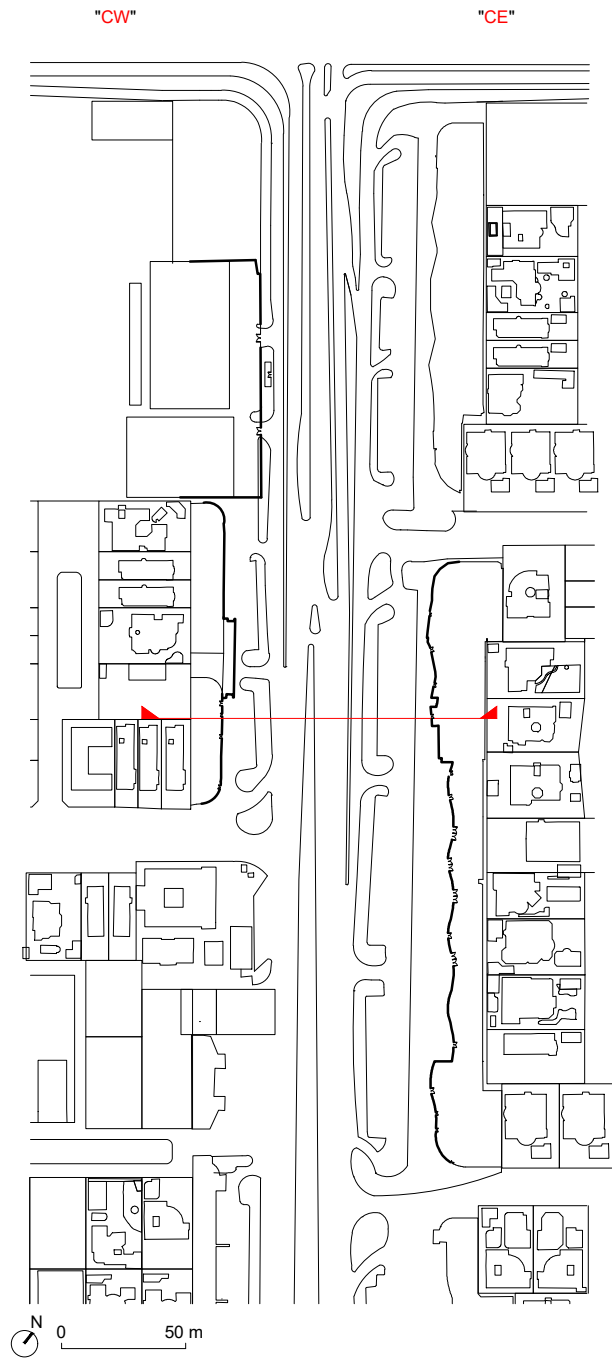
Khalid bin Al-Waleed Street: Plan and cross-section of sample "C." (Source: Author's Edition).
